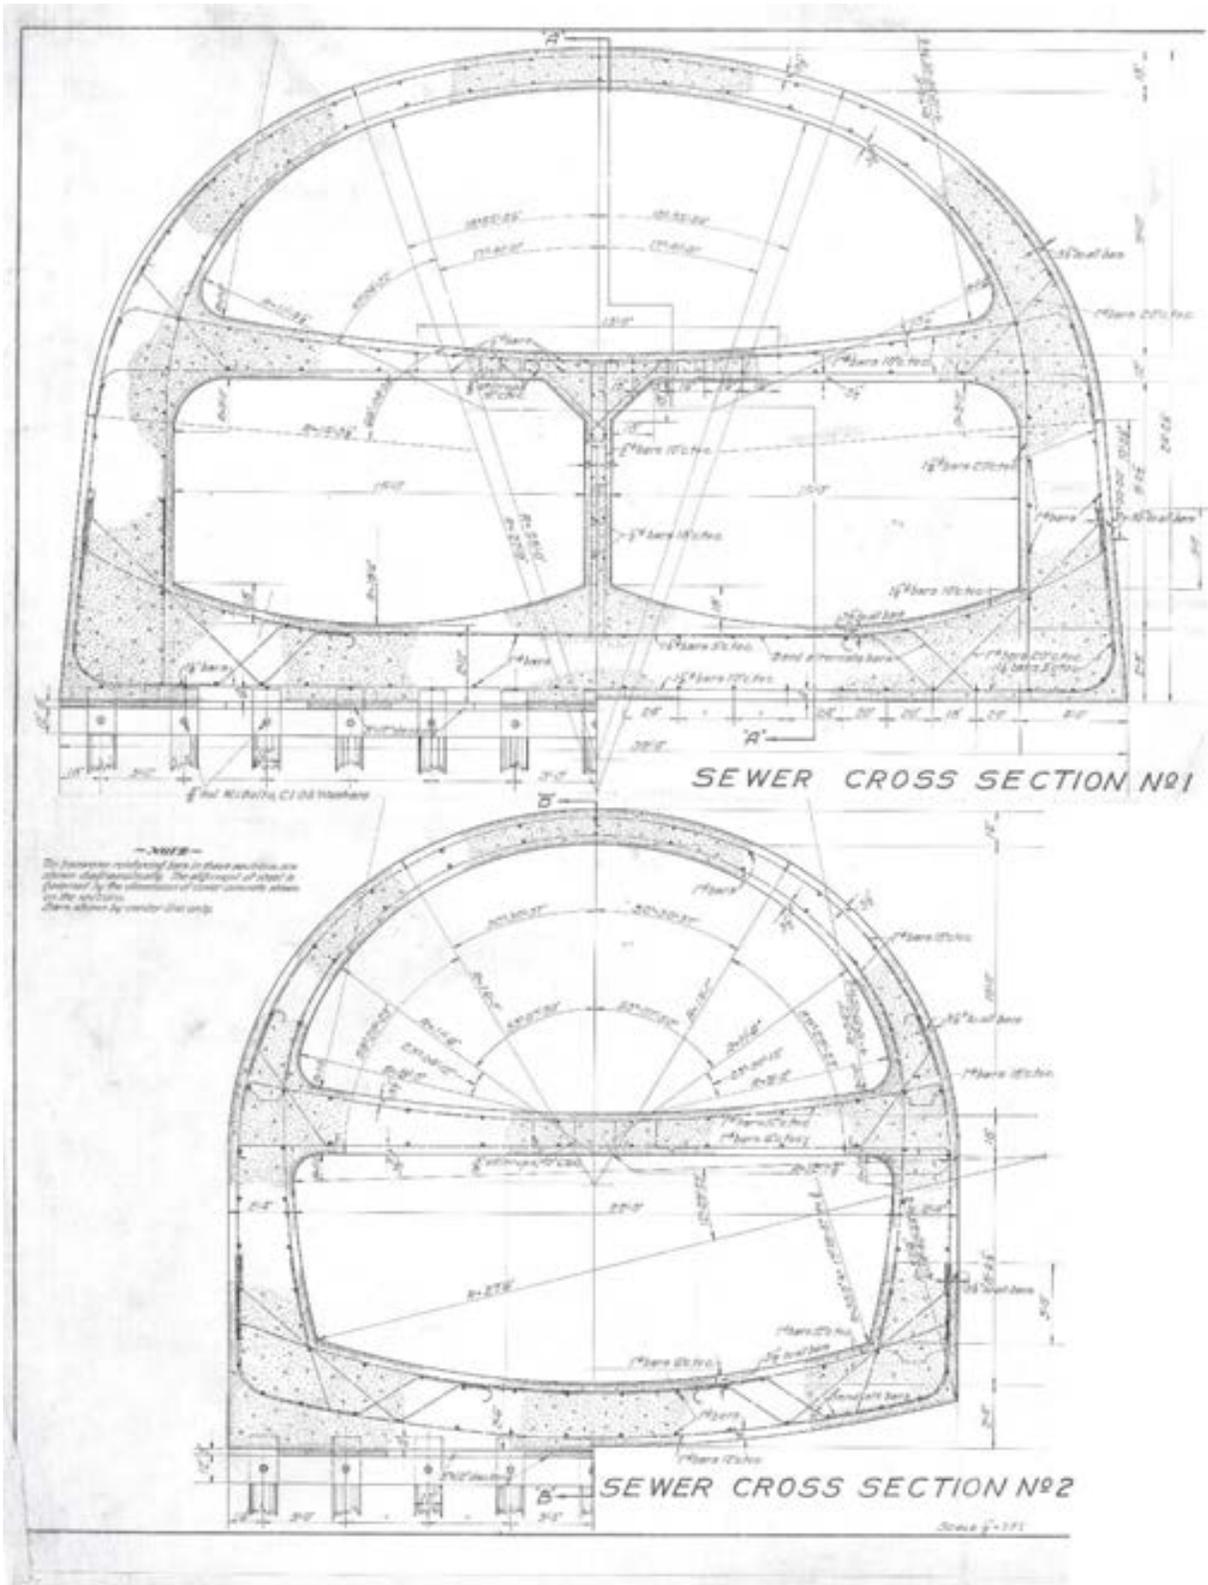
CSO Outfall BB-006 Cross Sectional Views
